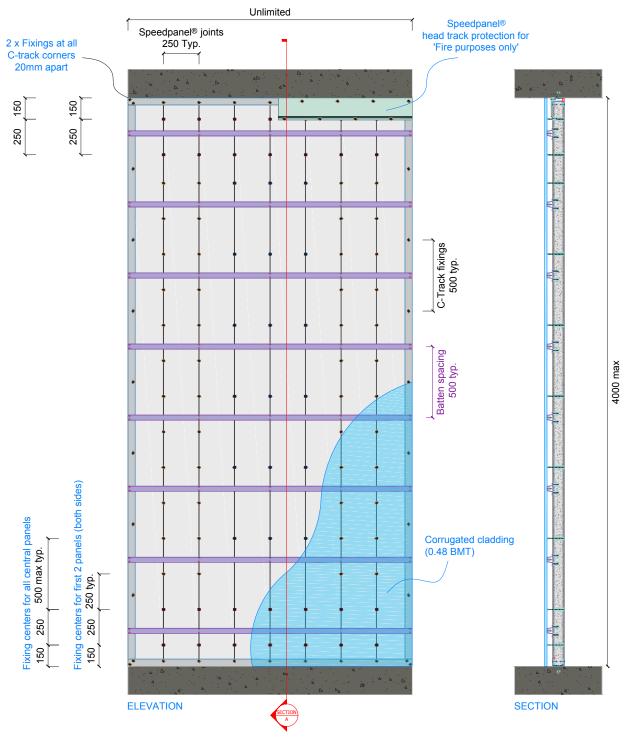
SYSTEM 'D' (ELEVATION & SECTION SYSTEM FIXING LOCATIONS & SPACINGS (CENTRE TO CENTRE)
